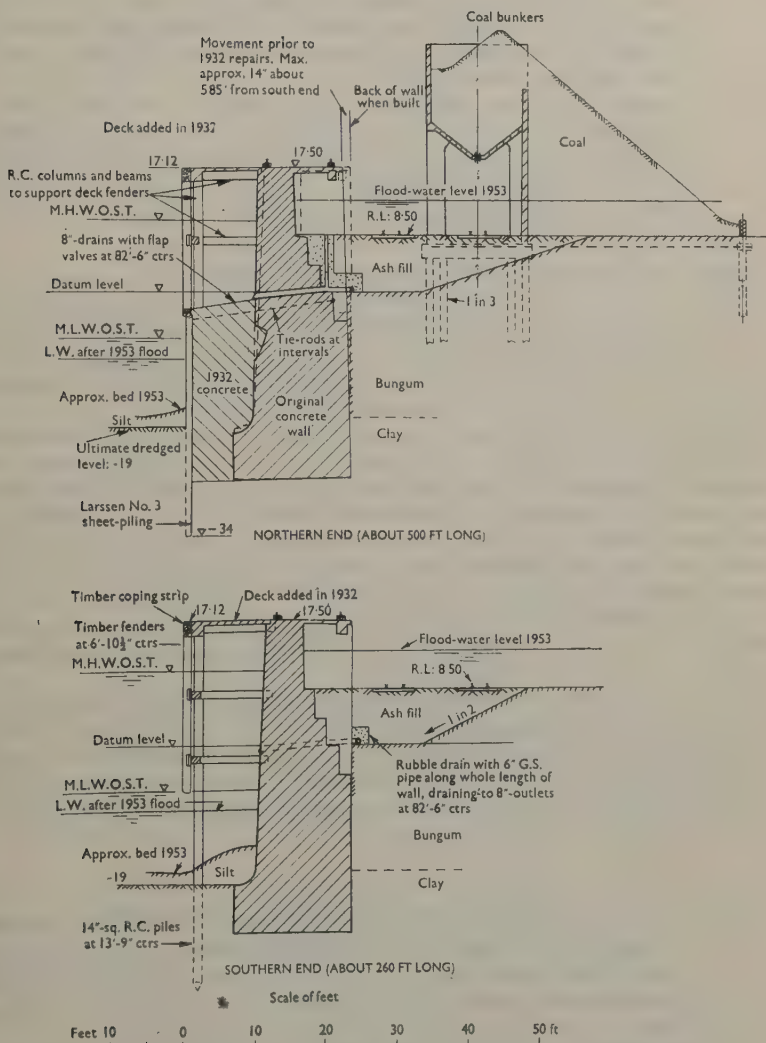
TYPICAL SECTIONS OF EAST WALL AFTER 1932 REPAIRS
